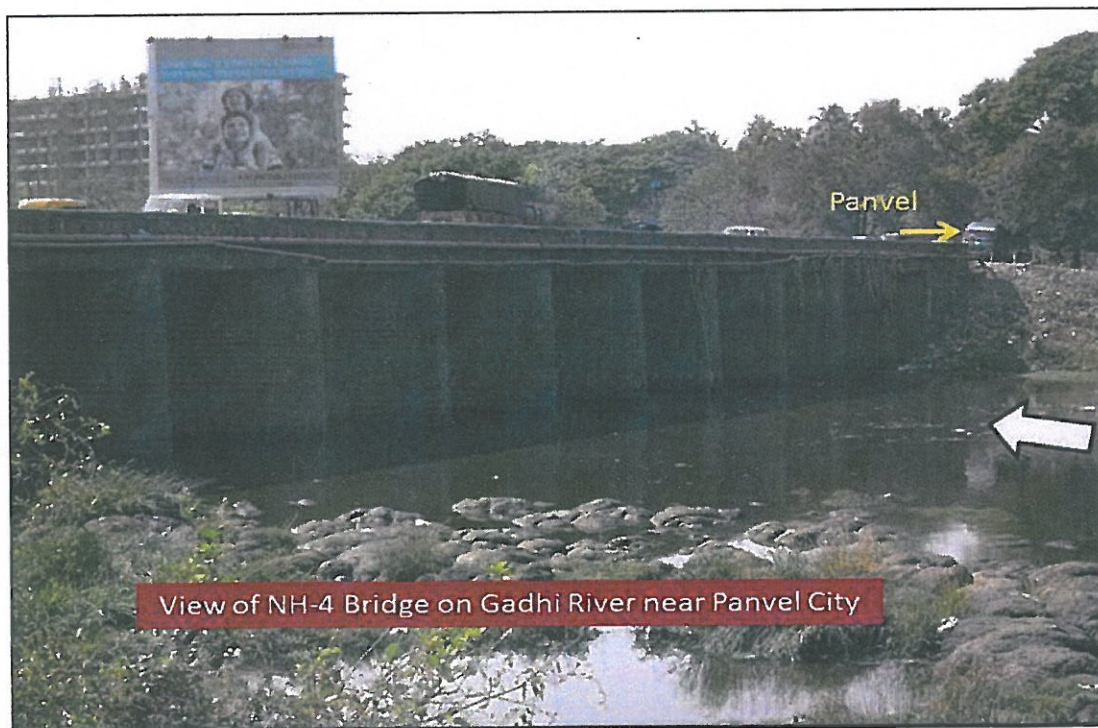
ROCKY OUTCROP AT NH-4 BRIDGE ON GADHI RIVER NEAR PANVEL TOWN
